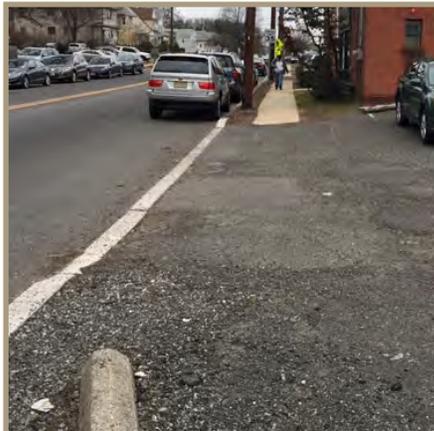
A sidewalk disappears in front of a parking lot along North Avenue, looking eastward on North Avenue. (Photo courtesy Lisa Lee, EZ Ride)
